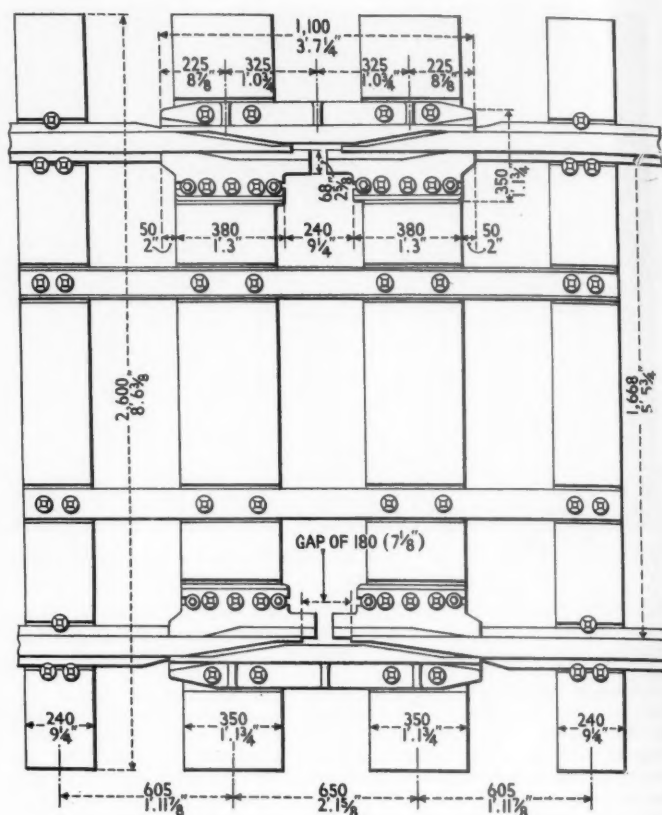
The "Martinet" type of expansion joint, used with reinforced concrete sleepers
